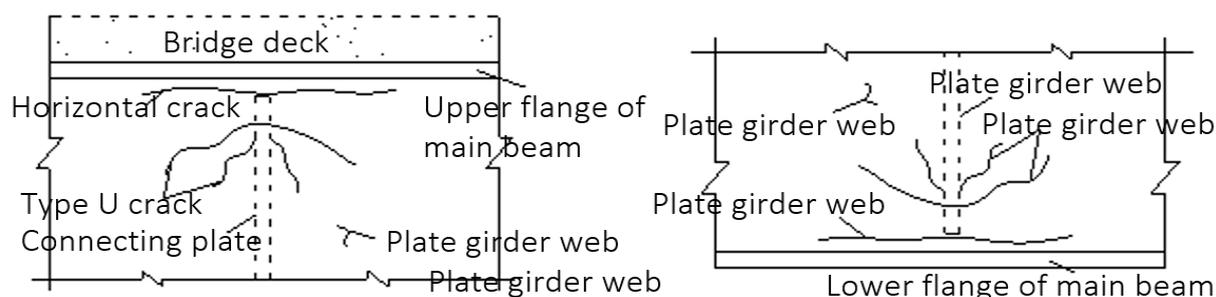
Diagram of fatigue crack caused by out-of-plane deformation
